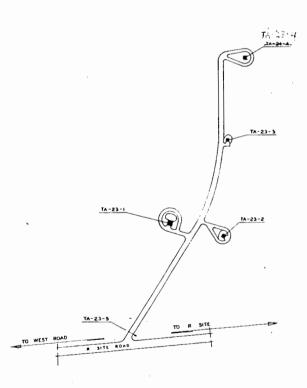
Structure Location Plan for TA-23 - NU Site (1950 Drawing from the LANL Technical Area Structure Location Plans)
